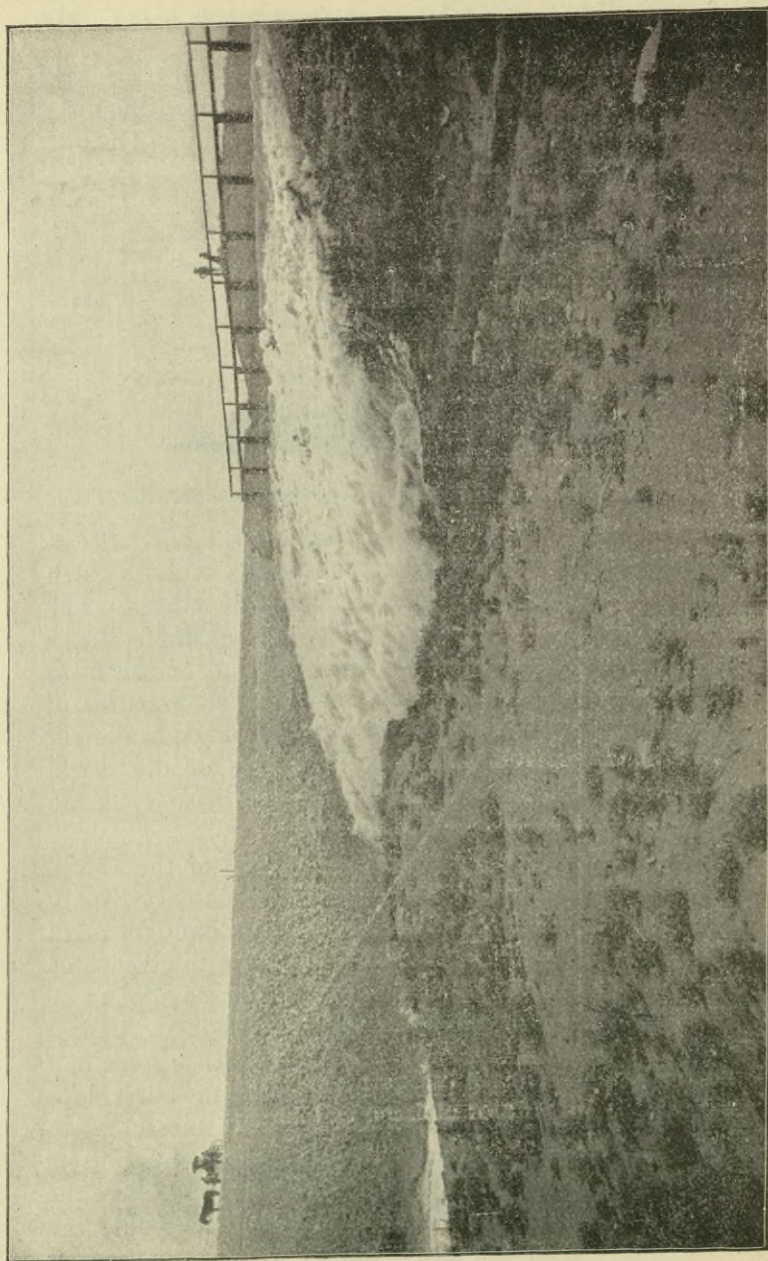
PLATE XXX.—VIEW OF PECOS DAM, UNDERSLUICE AND WASTEWAY.
